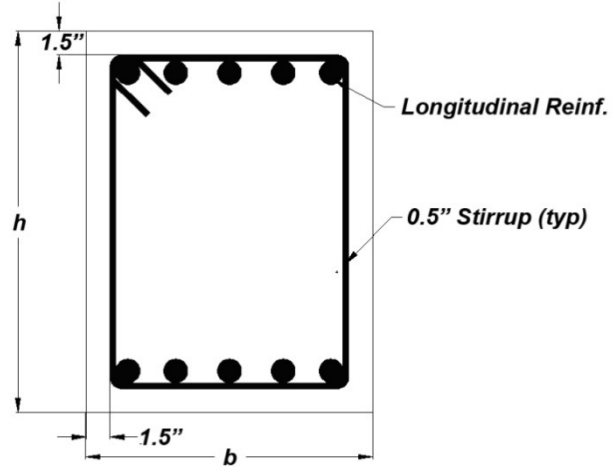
Typical beam - refer to Table 4.1 for specific details.
